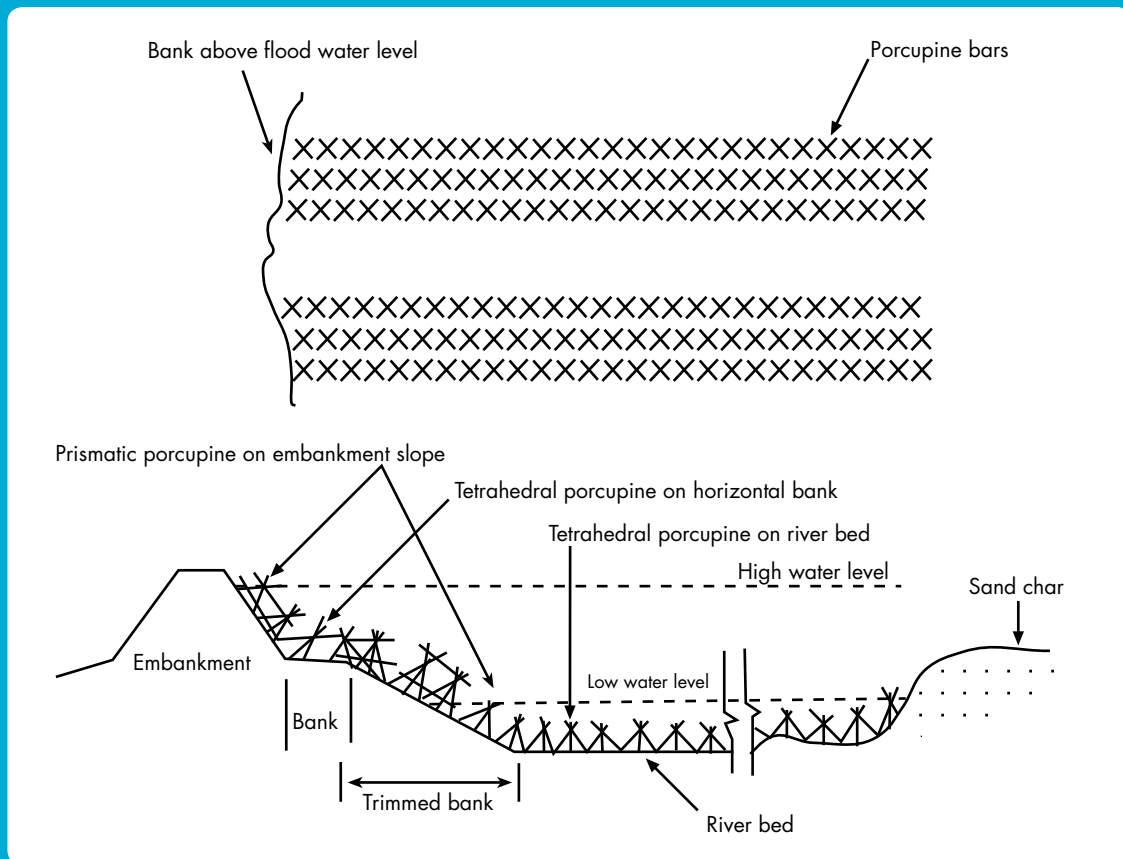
Plan (above) and cross-section (below) of a porcupine bar for embankment protection
